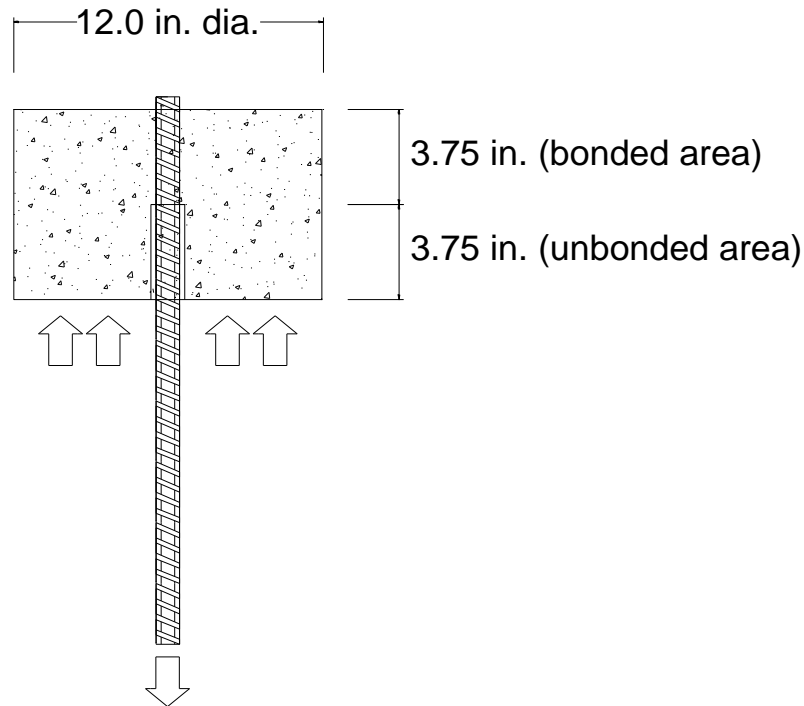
Dimensions for pull-out specimen testing No. 6 bar
